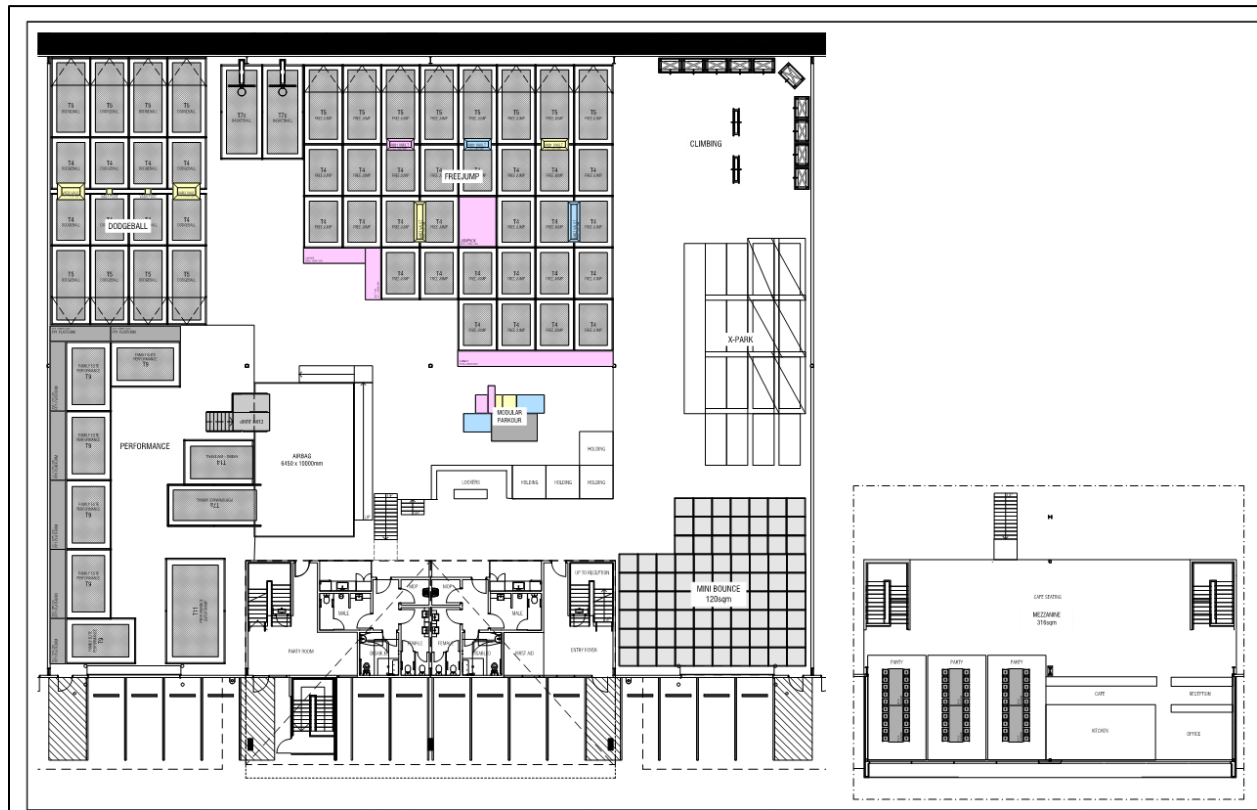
Proposed Floor Plan (Source: 2M Creative, 2023)
